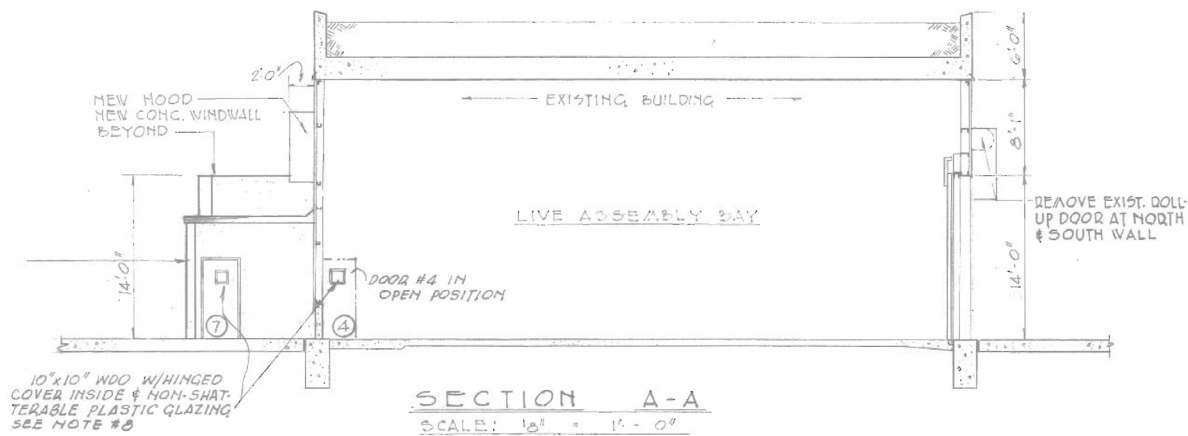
Property 23656, alterations to north and south elevations from 1962 WS-KR plans.
